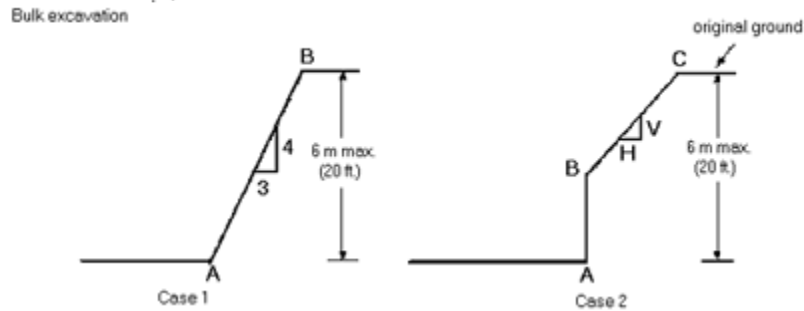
BULK EXCAVATION SLOPING IN LIEU OF SHORING (WORK SAFE BC, 2009)
